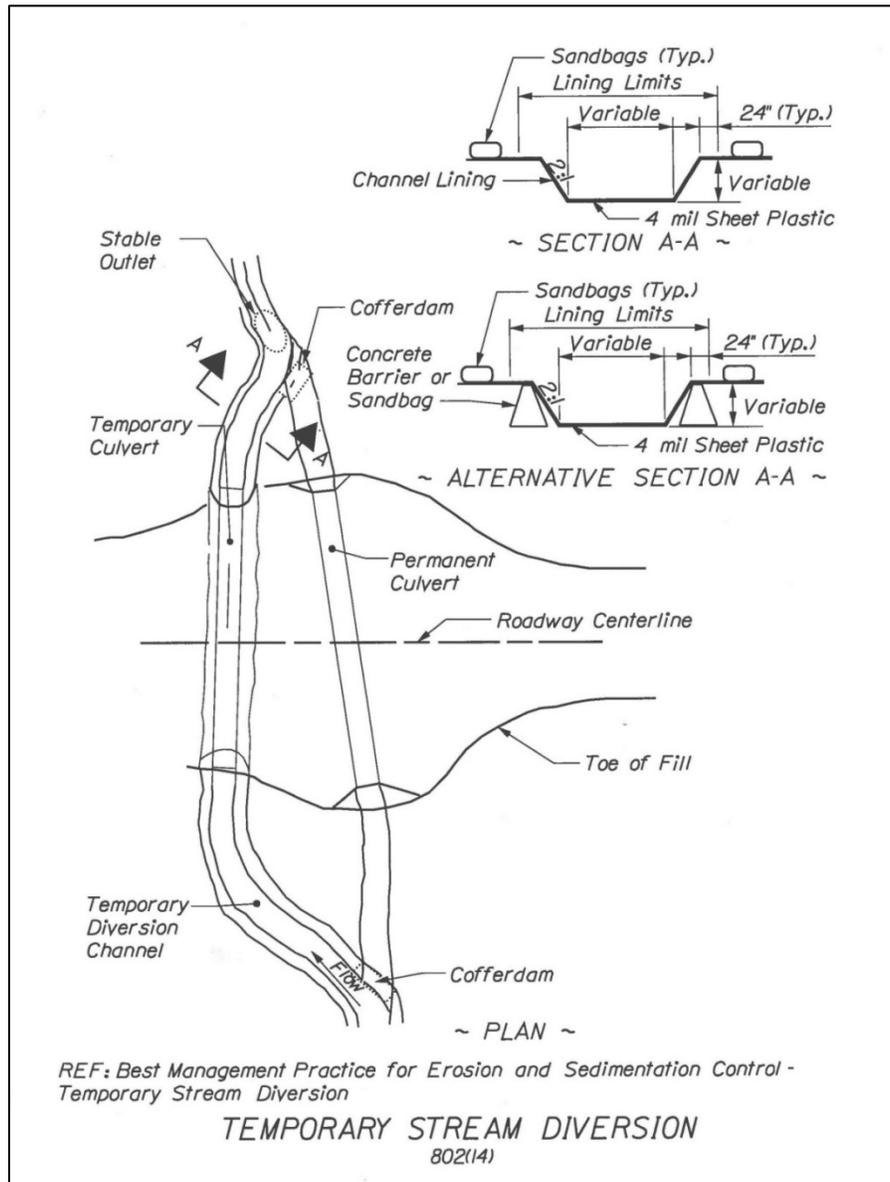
Typical layout and cross-section of a bypass channel used for temporary stream diversion.
